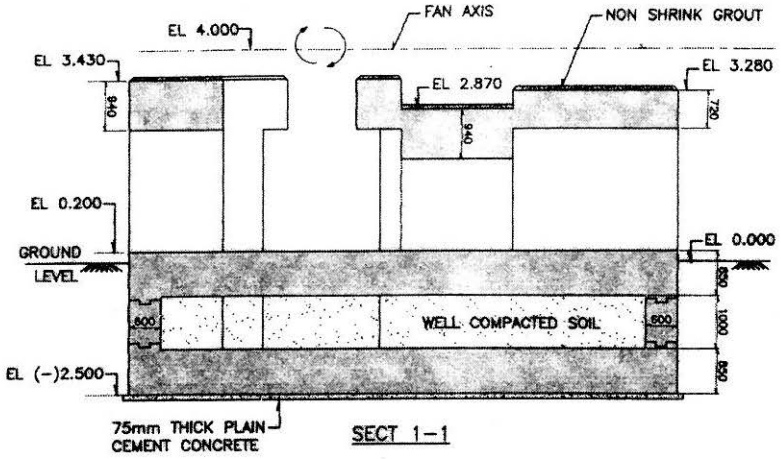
Longitudinal Section of I.D. Fan Foundation
